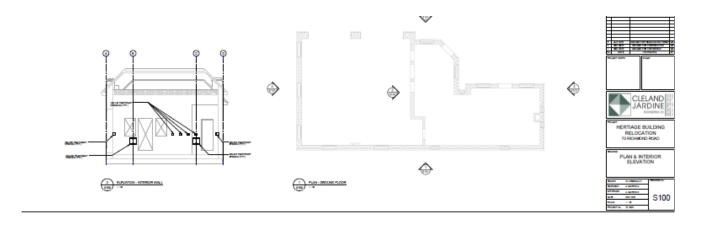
Revised elevations and sections illustrating the Service Station set on the steel frame. Source Cleland Jardine Engineering Ltd. 2023
